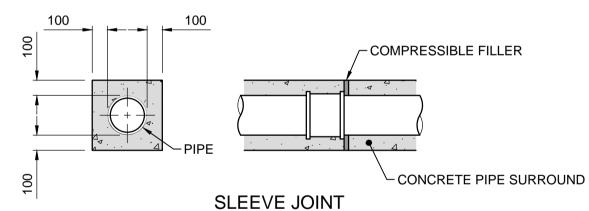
JOINTS FOR CONCRETE ENCASED PIPES SCALE 1:25
